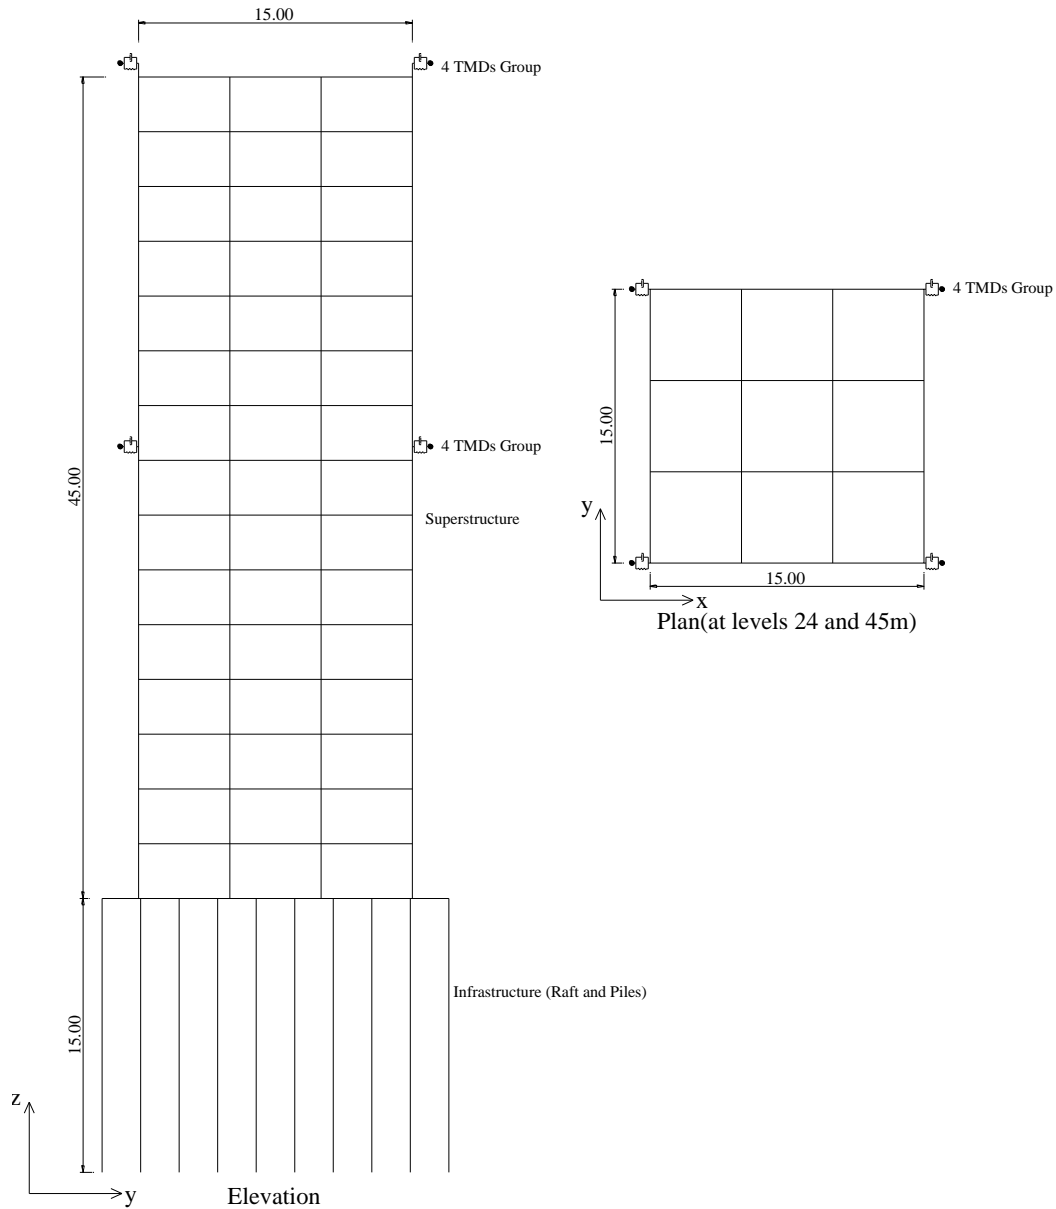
Elevation and plan of the HRB model with two groups of TMDs
